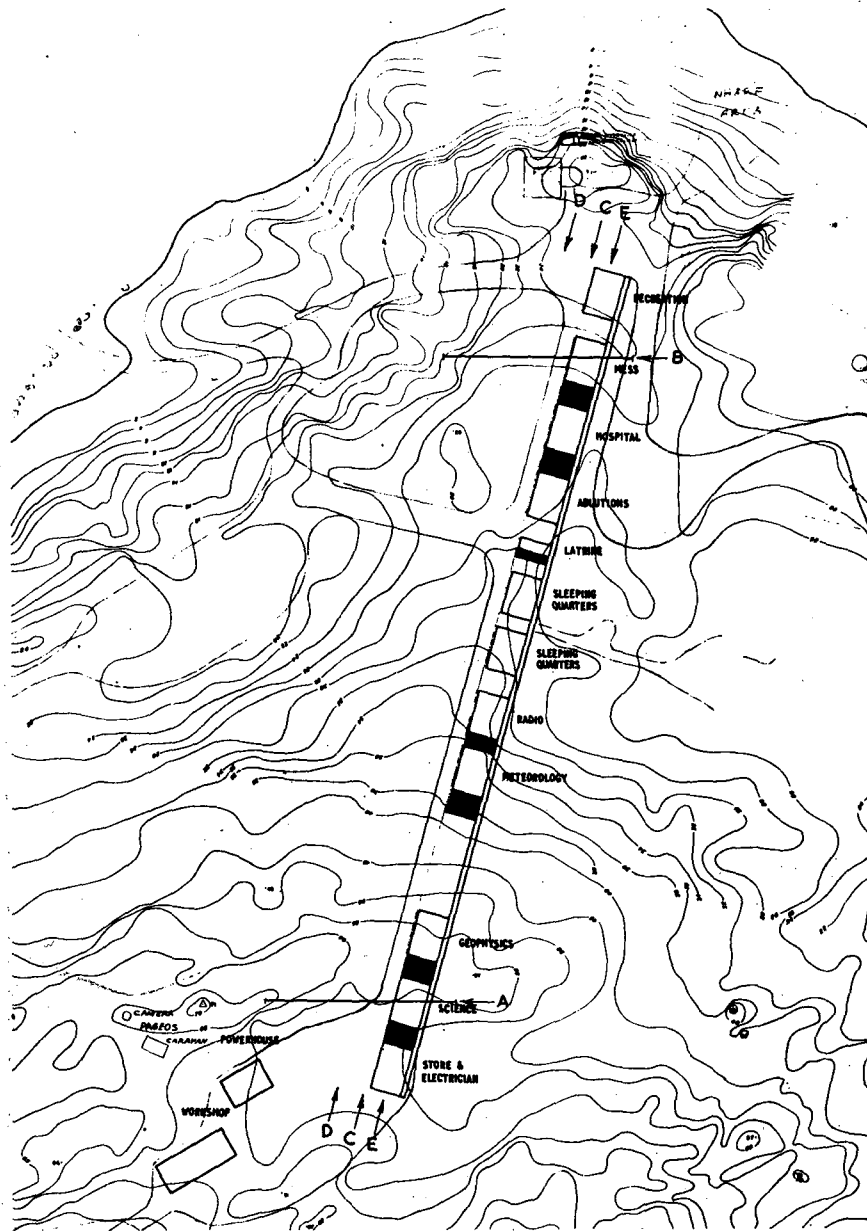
Repstat site plan showing final positions of buildings and drift measurement lines.
